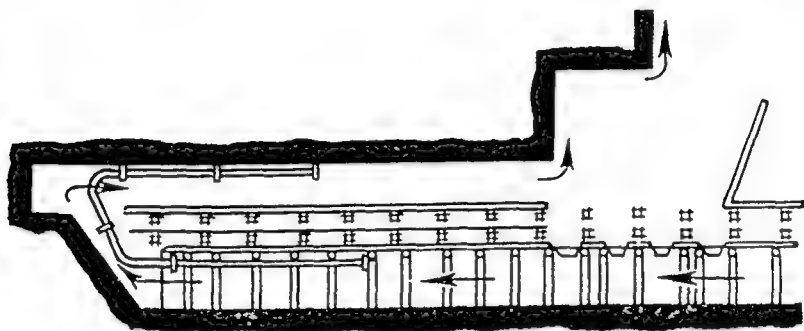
Ventilation layout for the face of a haulage road in a steep seam subject to sudden outbursts
